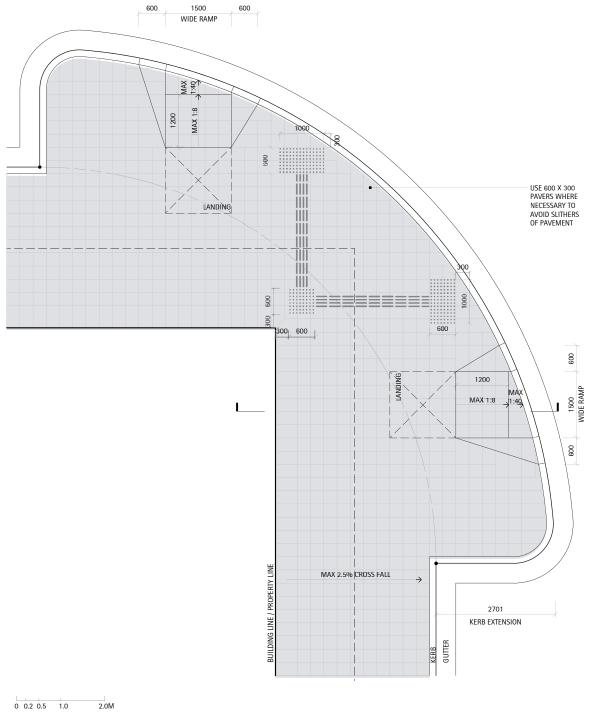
Streets Corner Plan: Kerb Extensions 1500 Ramp
